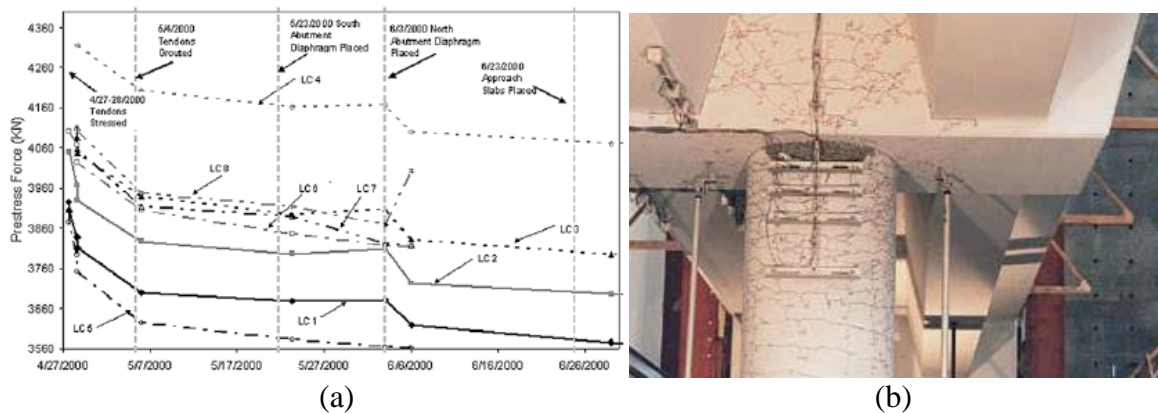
Behavior of spliced girders: (a) prestress loss (Pantelides et al. 2007); (b) failure mode (Holombo et al. 2000)
